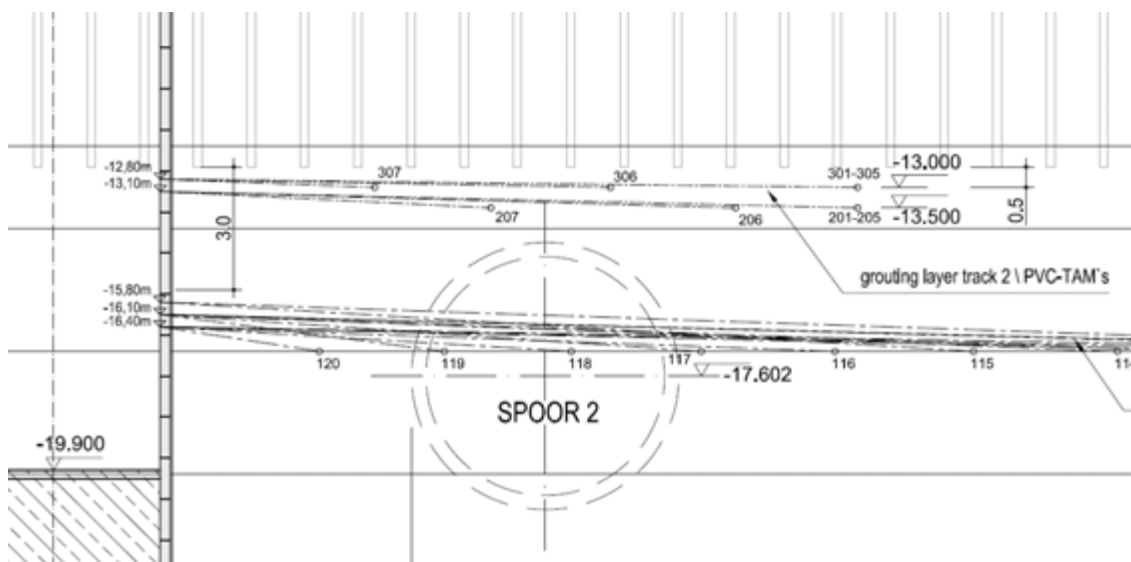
Section looking South showing East Tunnel and lower and upper injection pipes
